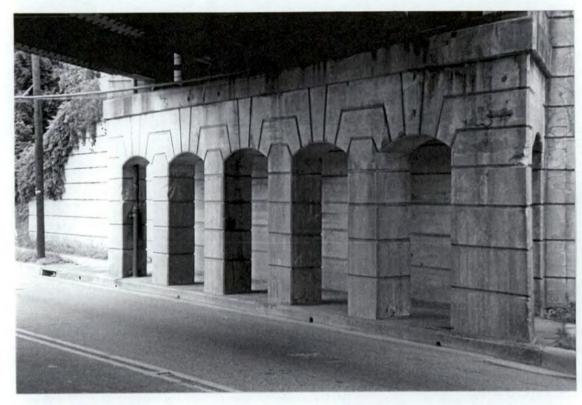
Highland Avenue Southern Railway Bridge - west bent and walkway looking southwest
